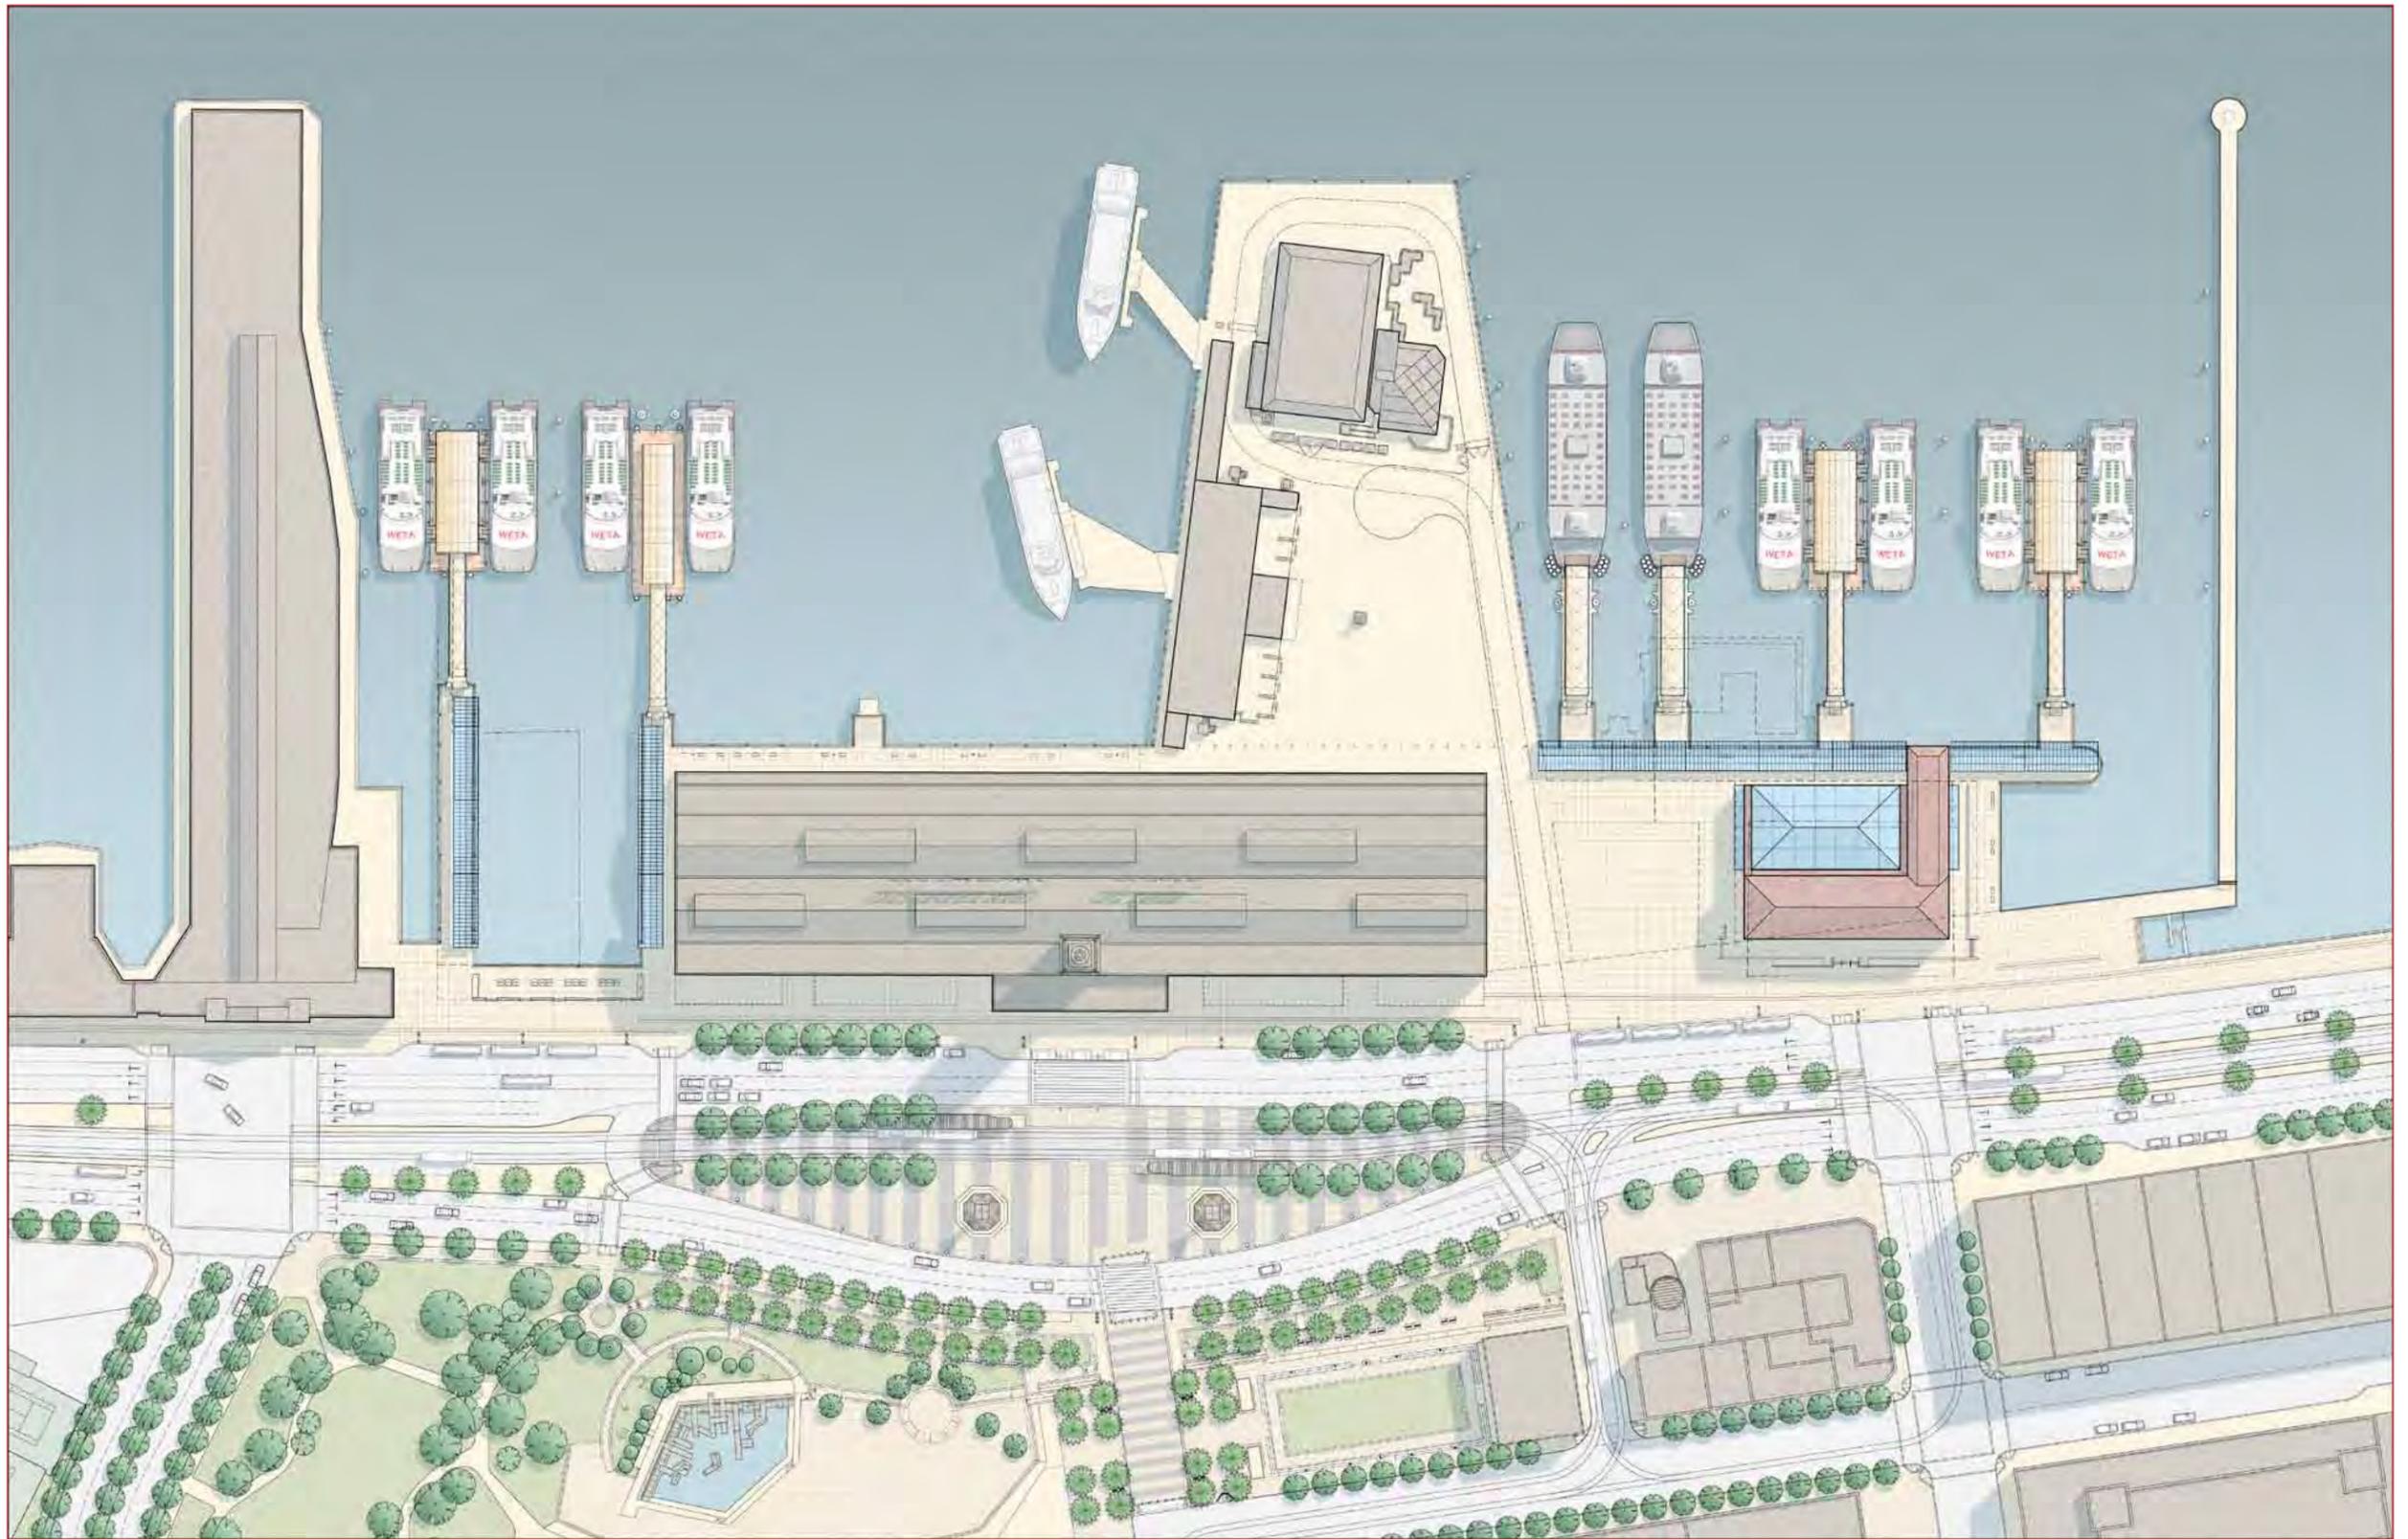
Phase 3 Roof Level Plan (2020 to 2030) *(with potential future renovation of the Agriculture Building)
